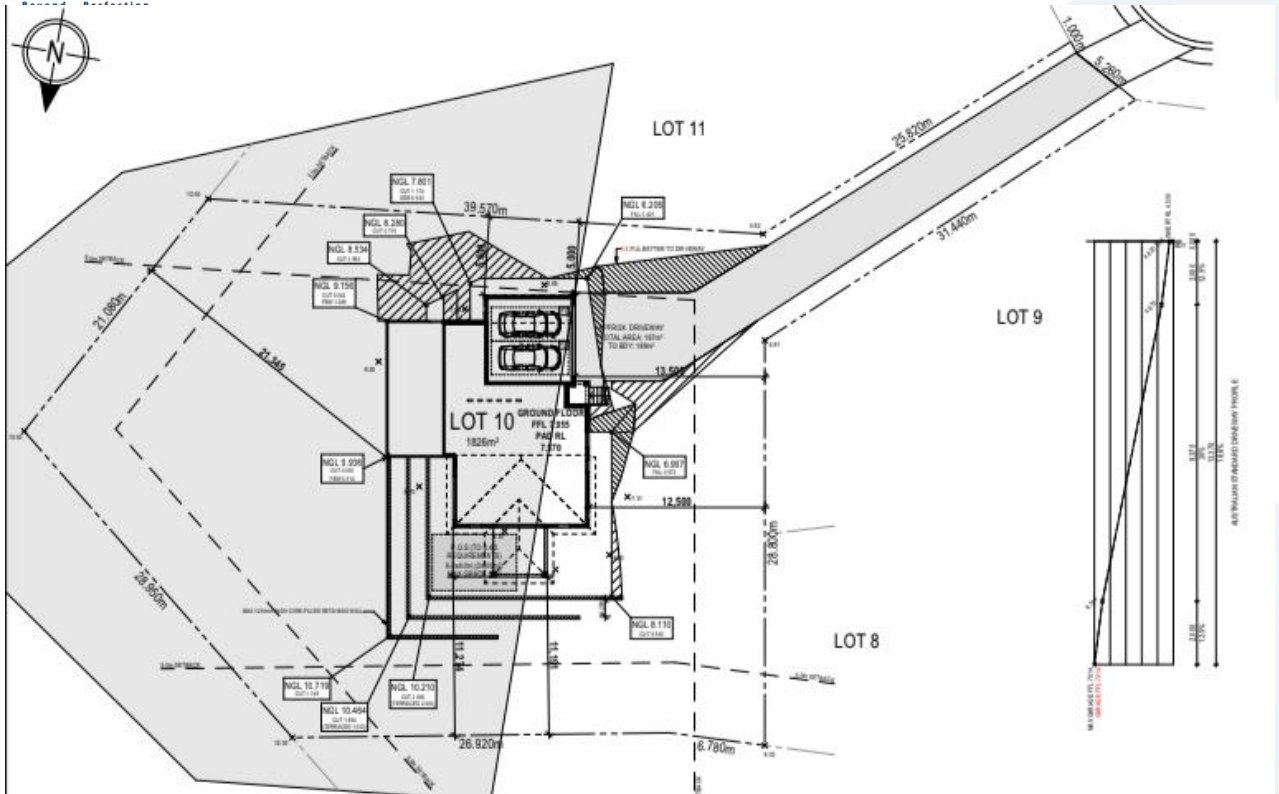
PROPOSED RESIDENTIAL HOUSE LAYOUT
